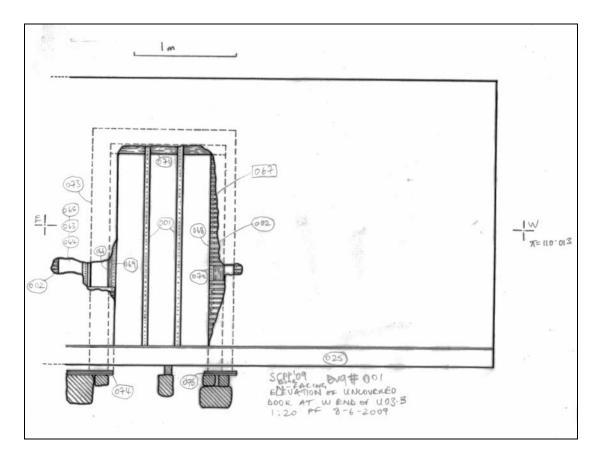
U03.3 Elevation of unblocked door (Drawing 1)
